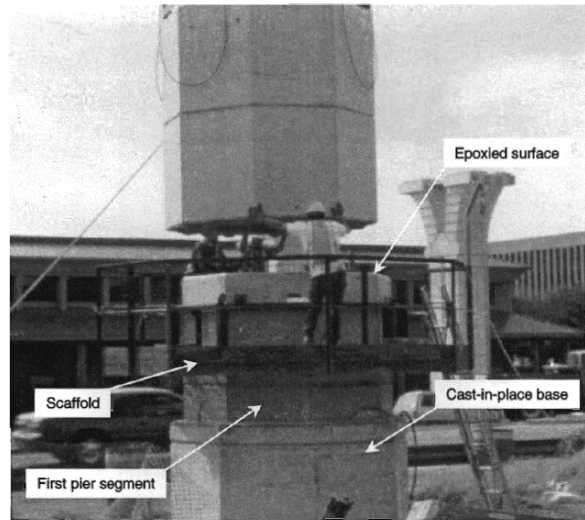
CIP base forming a rigid moment connection between base segment PC16-1 and foundation in the US-183 bridge (Davis et al. 1998)
